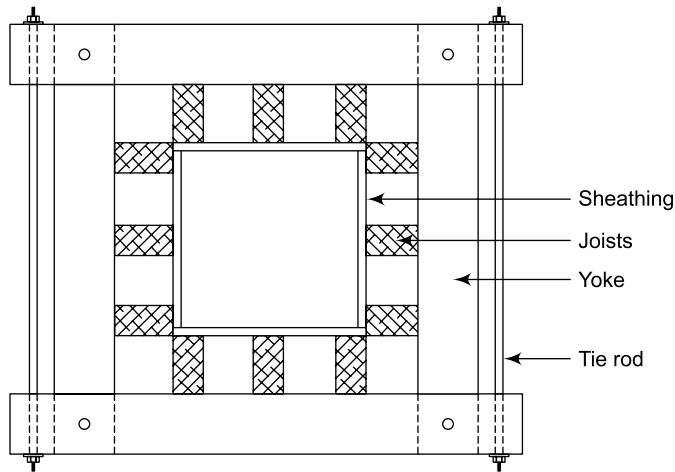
Arrangement of Different Components in the Column Formwork.
